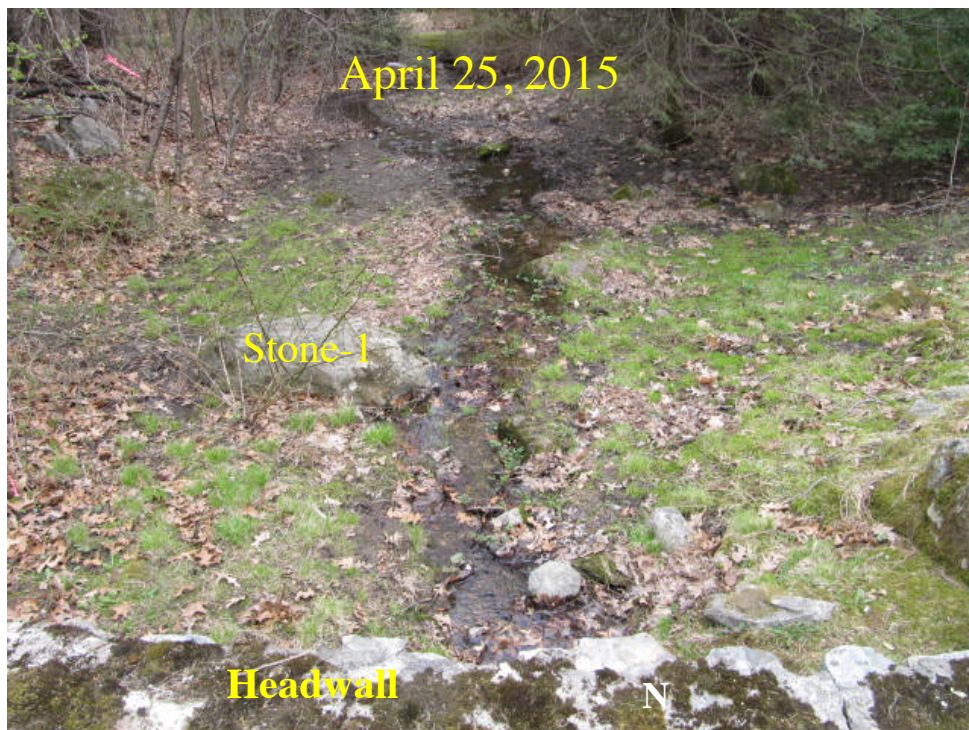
Photo B. View of the downslope side of the culvert at 49 Woodcrest Road in mid-spring 2015. Photo by B. Prokop.
